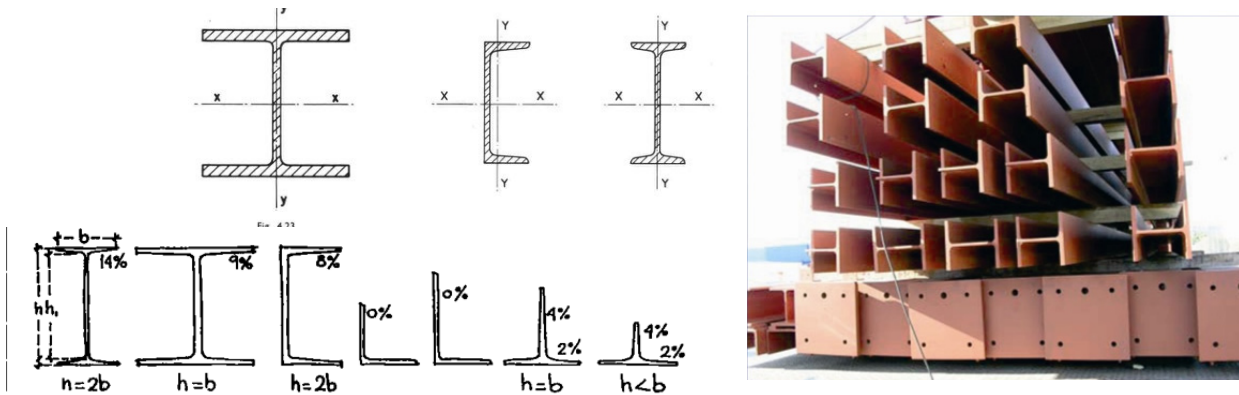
Steel structures. Welding. Designs by Fernando Ripollés.
